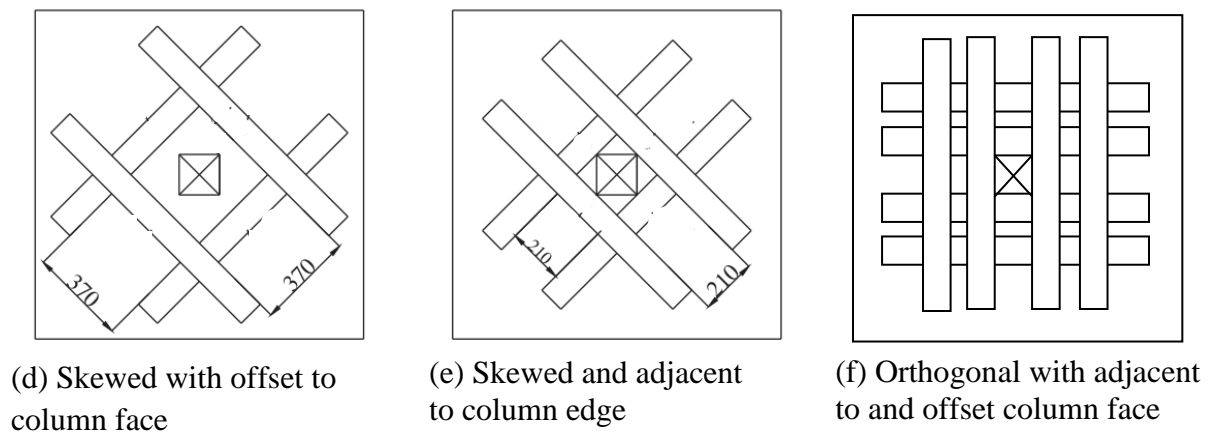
Specimen Detail (Khalend et al., 2012)
